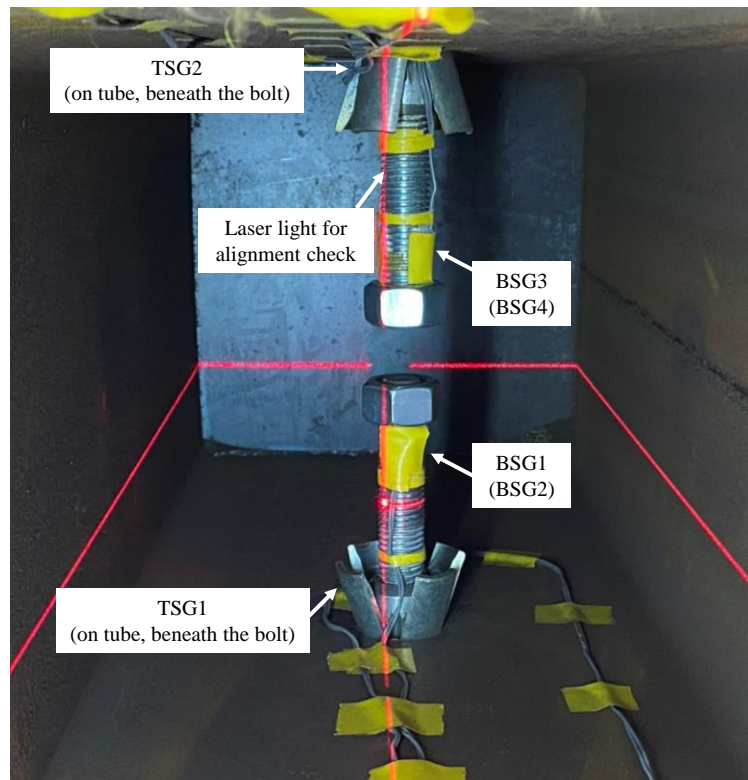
Inside view of the steel tube attached with strain gauges and check for alignment.
